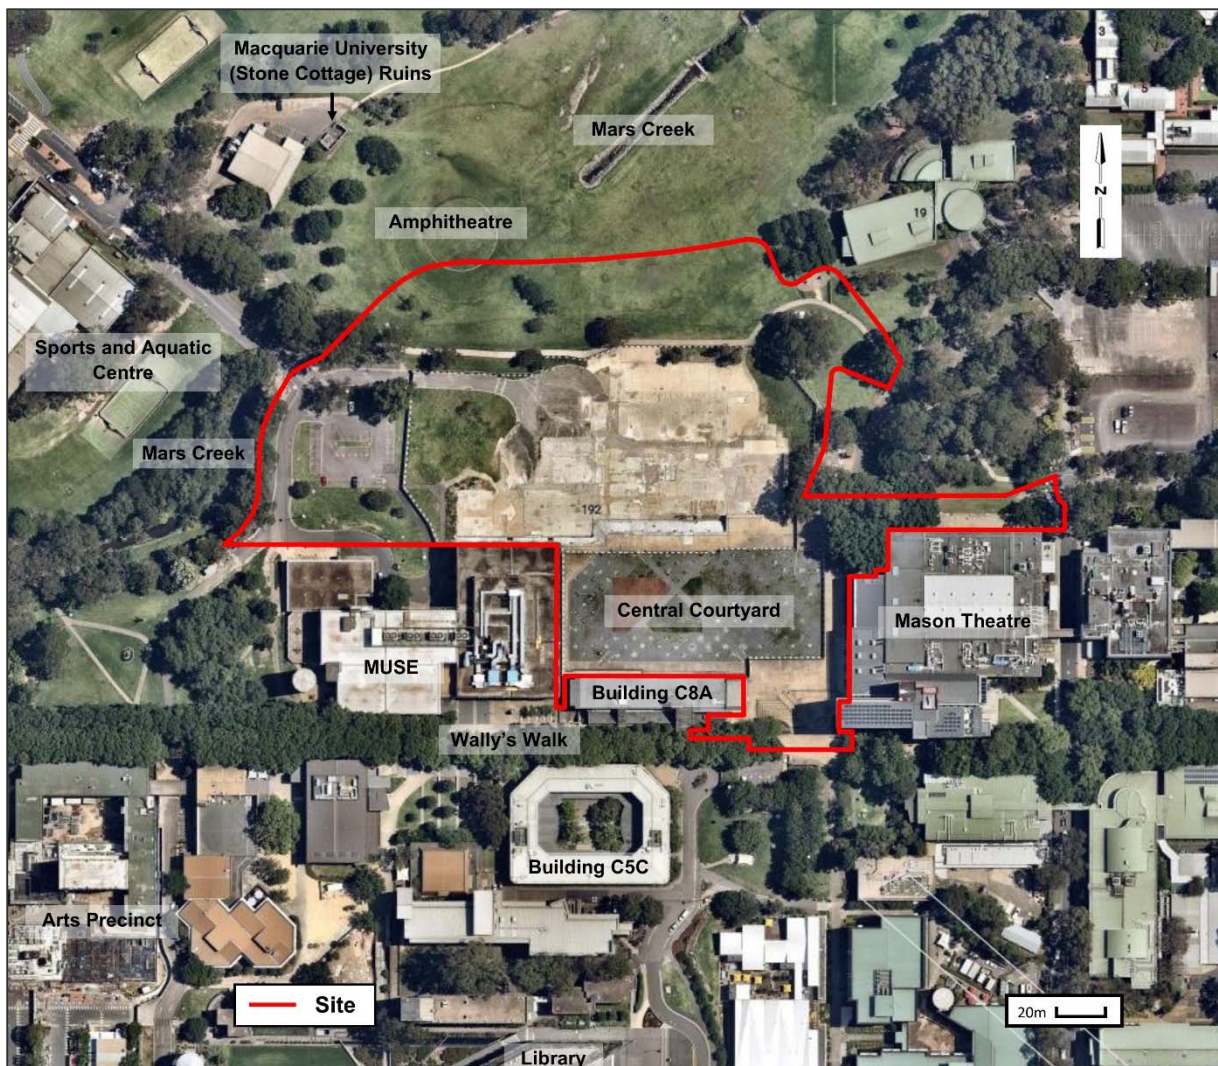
| Aerial view of development site and surrounds (Base source: Nearmap)
